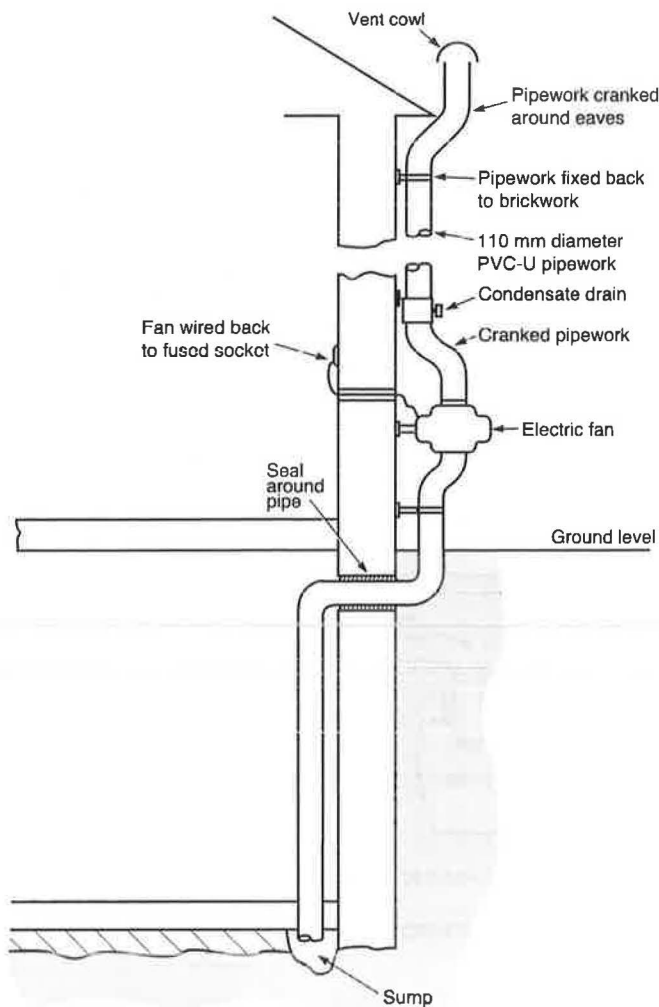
A mini-sump to a full cellar or basement with external fan and ductwork
